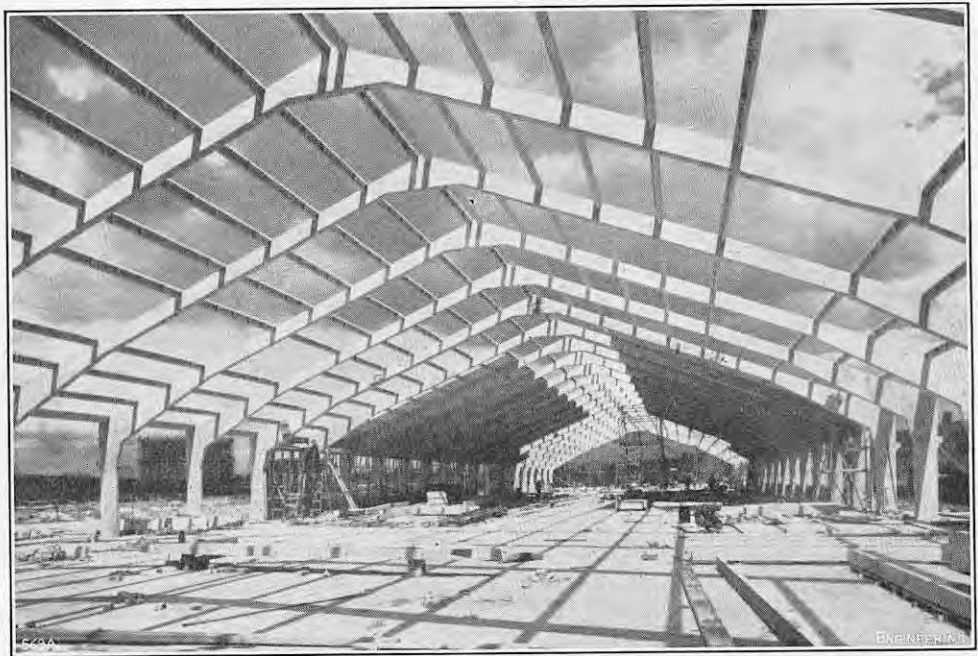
PRE-CAST STRUCTURE AT FIRST-FLOOR LEVEL.
